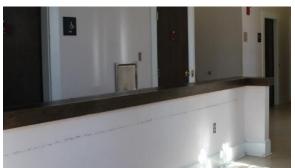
, Historic Courthouse, Second Floor, Room 202, detail view of horizontal scuff marks at north low wall.
